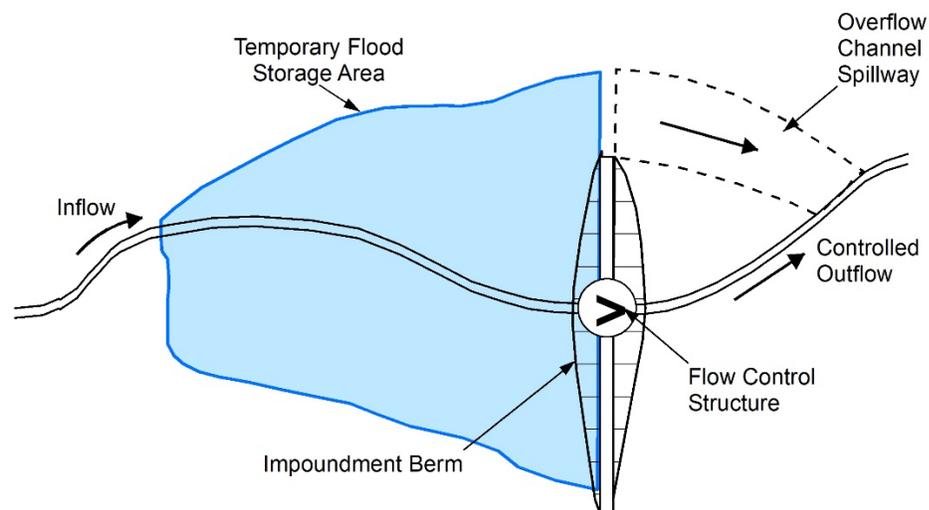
Typical Layout of an Online Temporary Flood Storage Area
